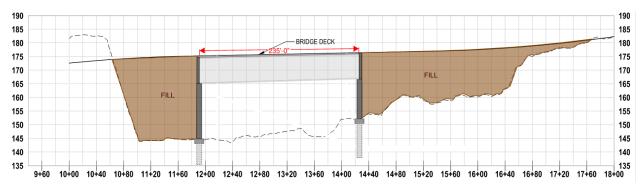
Option 2 - Single 235-Foot-Span Prestressed Concrete Girder Bridge Elevation
